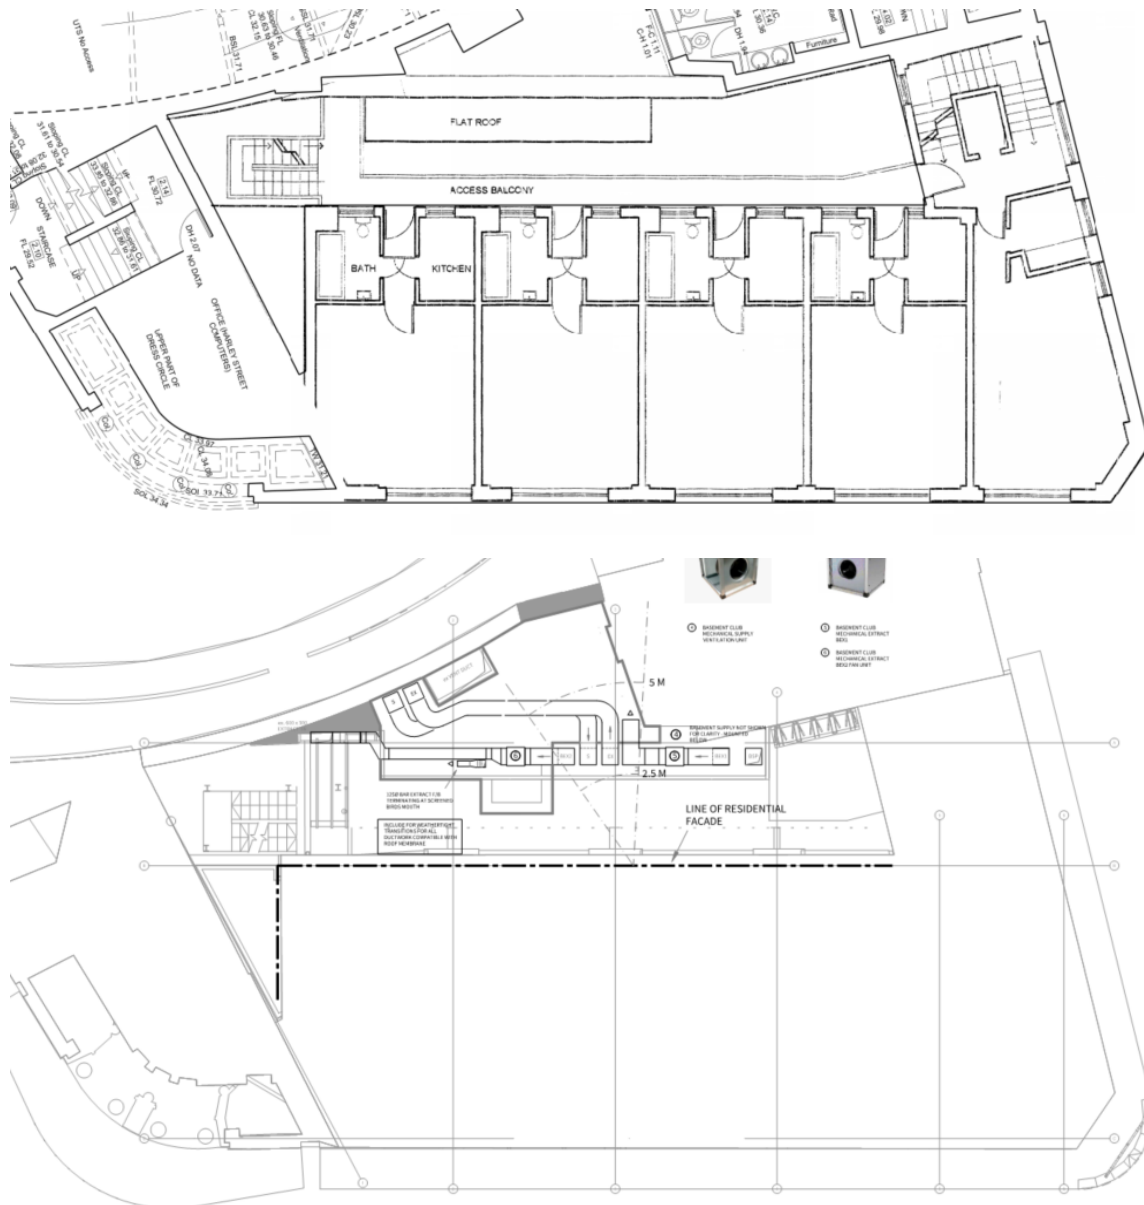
(above): Existing and proposed upper circle (Second floor) plan
